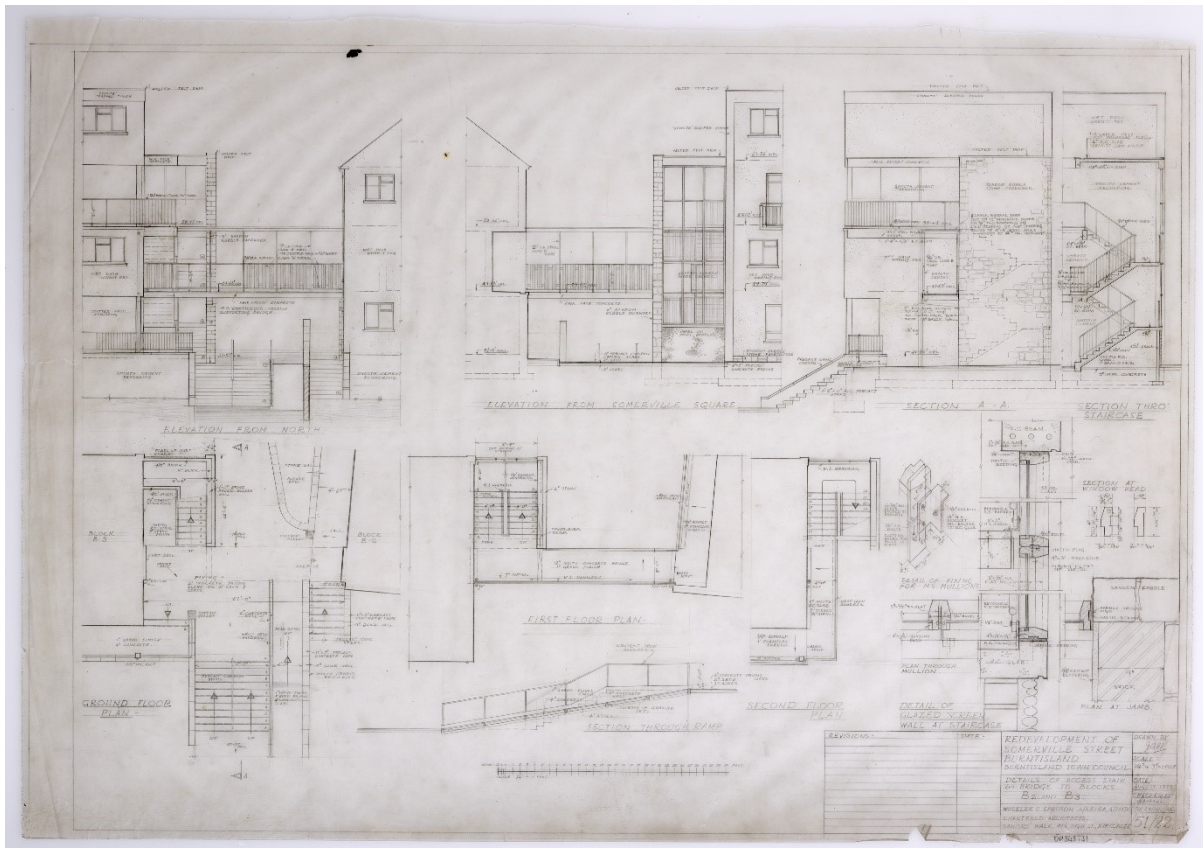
'Details of Access Stair and Bridge to Blocks' at Somerville Square, August 1955.
